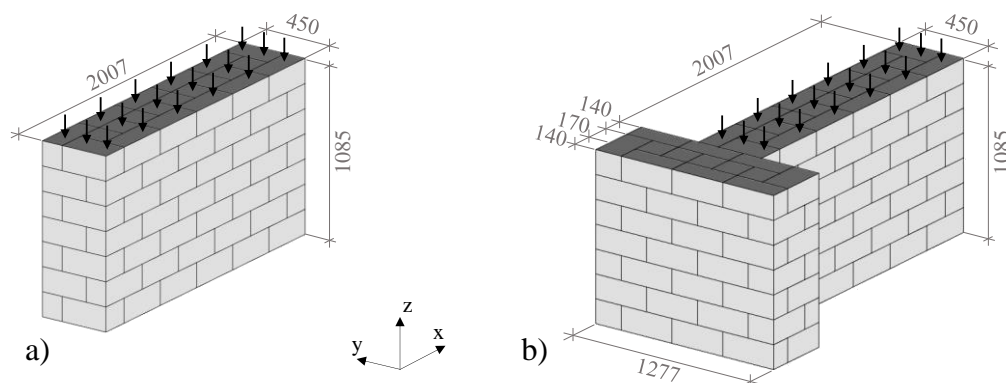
Three-leaf masonry walls geometry and loading condition: a) simple wall; b) T-wall (Gagliardo, Cascini, *et al.*, 2019).
